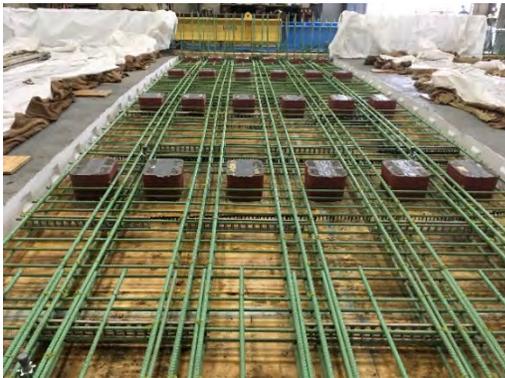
Match Casting of Joints in Precast Concrete Deck Panel
